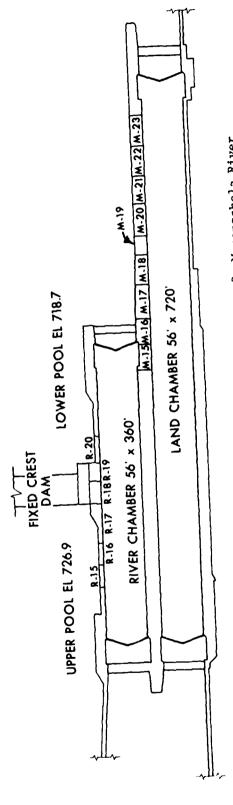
Site plan and test locations, Locks and Dam No. 3, Monongahela River
